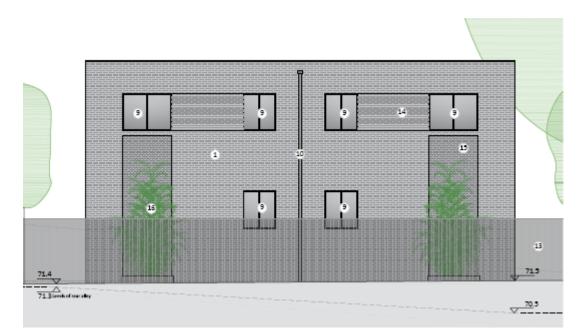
Amended rear elevation – Block A. All rear windows to be obscurely glazed.
